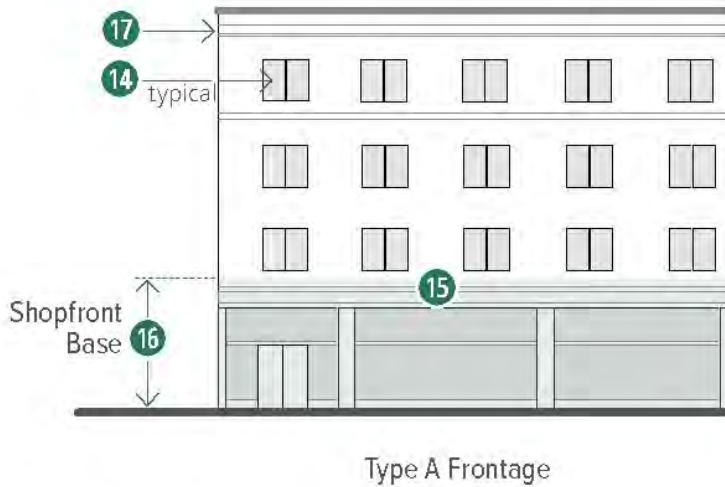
Main Street Storefront Building Elevation: Facade Design Requirements
